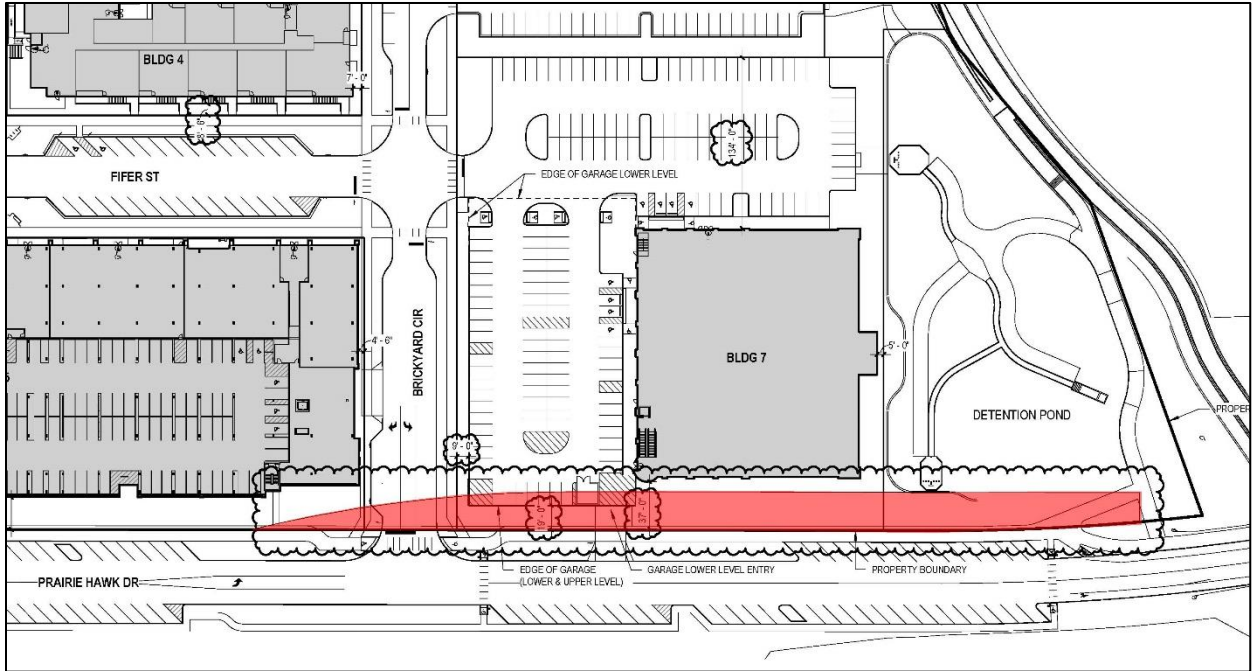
Brickyard Site Development Plan and Right-of-Way Segment
